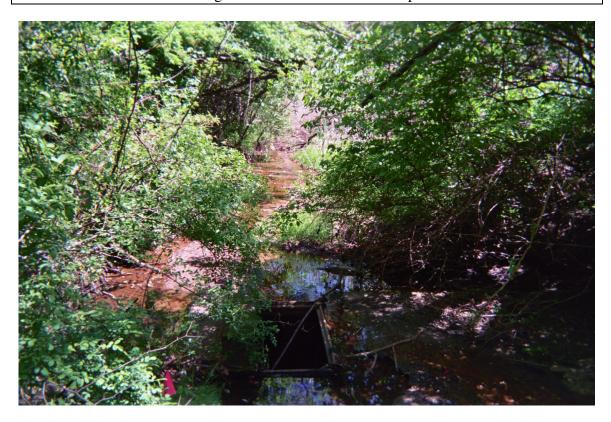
View looking east from AF-1 just beyond inlet. Note drop inlet.
